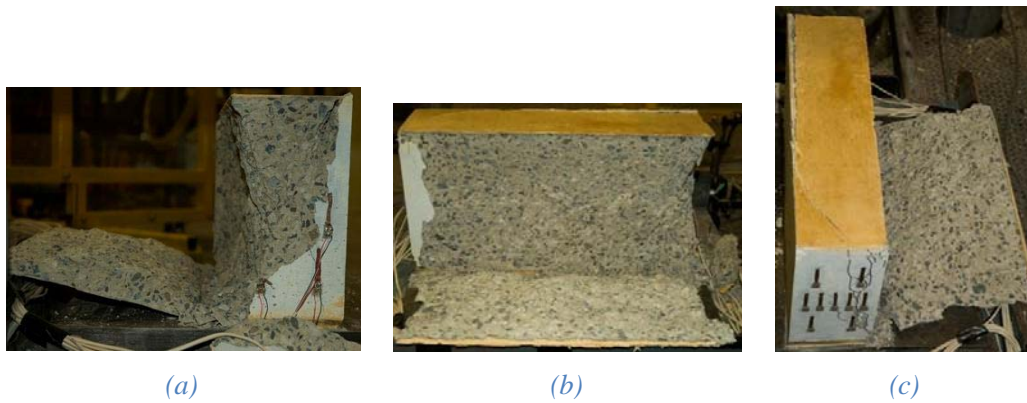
Failure pattern of concrete prism Test4-125; (a) front view; (b) side view; (d) top view.
